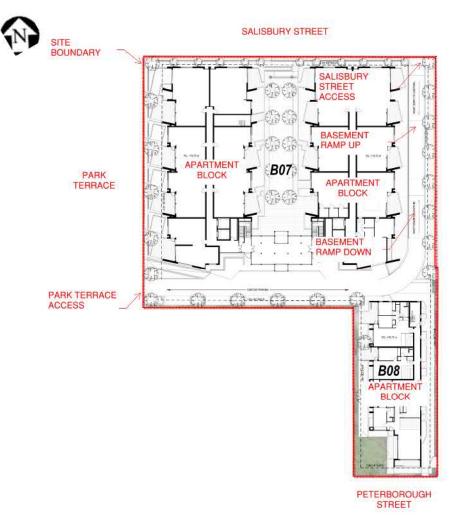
Site 2 Peterborough Street Proposed Site Layout
